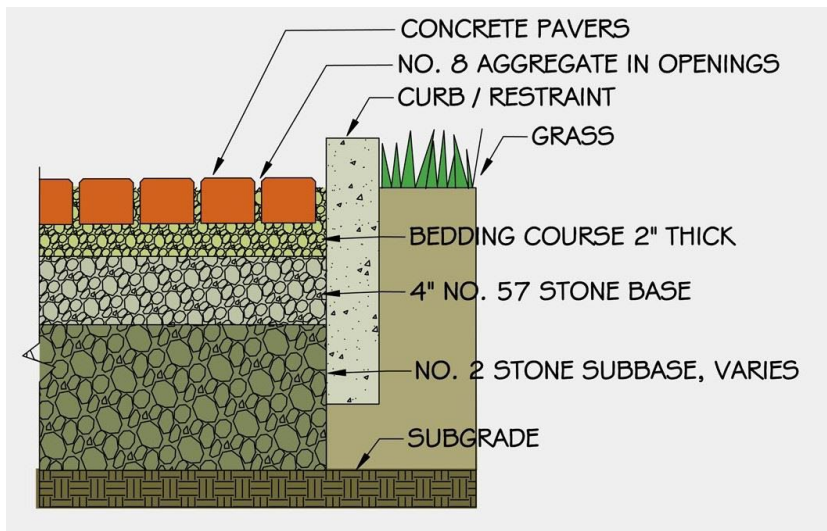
Cross-section of a typical residential permeable paver driveway or patio. Design may vary depending on site.
